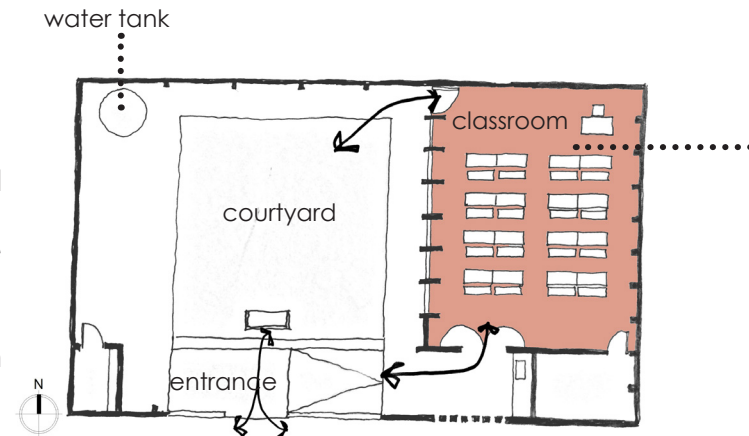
Floorplan of Grade 2 classroom and courtyard
